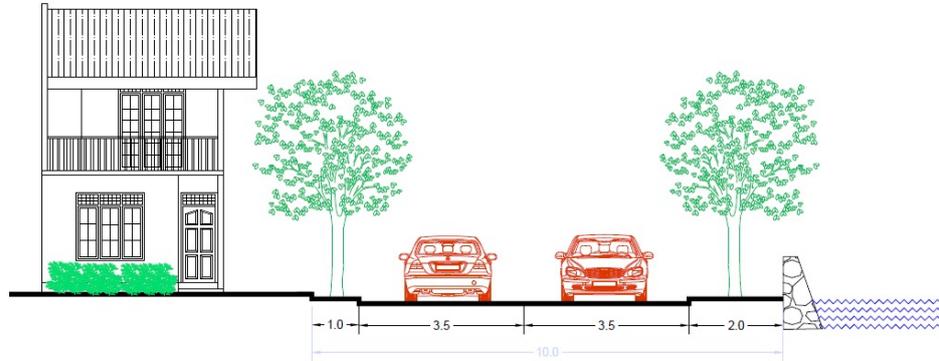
Cross Section of Water Front Road (Two Lane)
